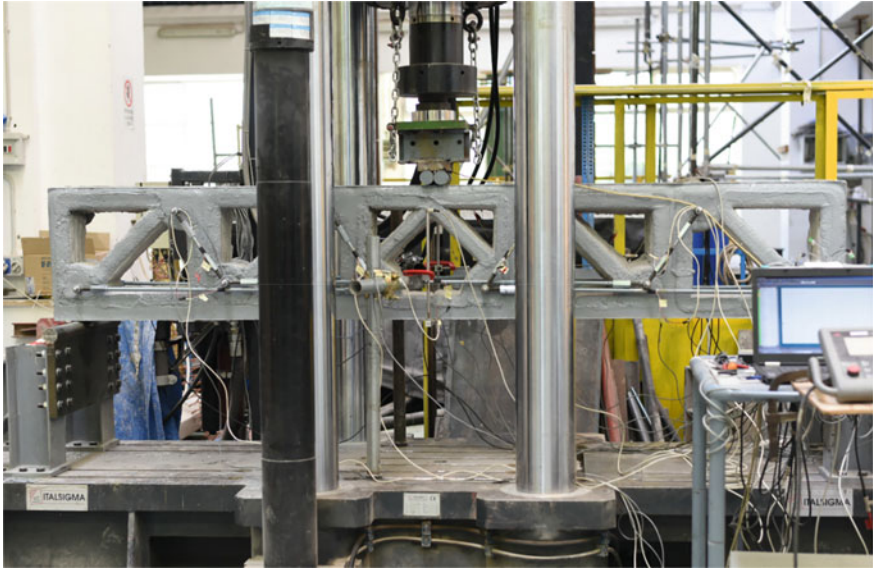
Equipped specimen for the three points bending test (Beam UniNa) (Asprone et al. 2018)
